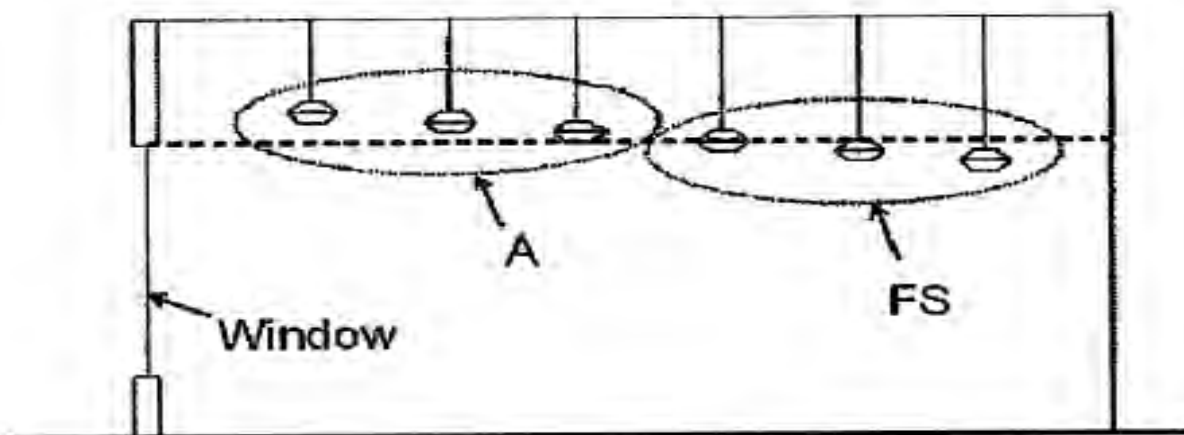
Figure B: Elevation view showing a nonresidential application of indoor lighting, labeled FS, which will be subject to this article and indoor lighting, labeled A, which is installed so that it is not subject to this article. This example presumes the structure in question is not elevated such that any of the luminaries labeled A in the figure
